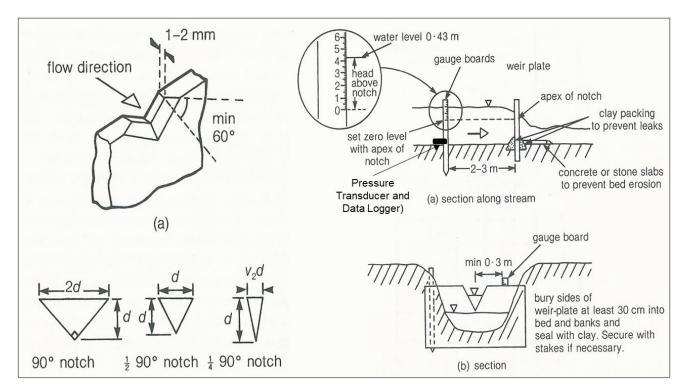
Notch dimensions and installation arrangements (from Brassington, 2007)
